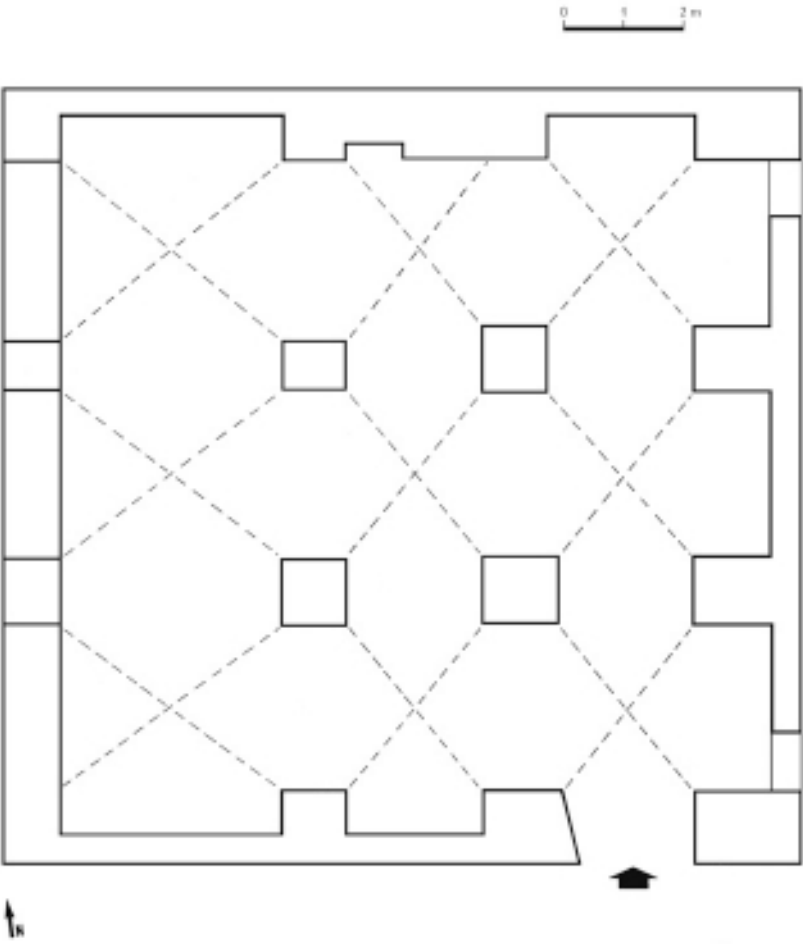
Plan of palace in Acre (House 1:1) (drawing by author).
